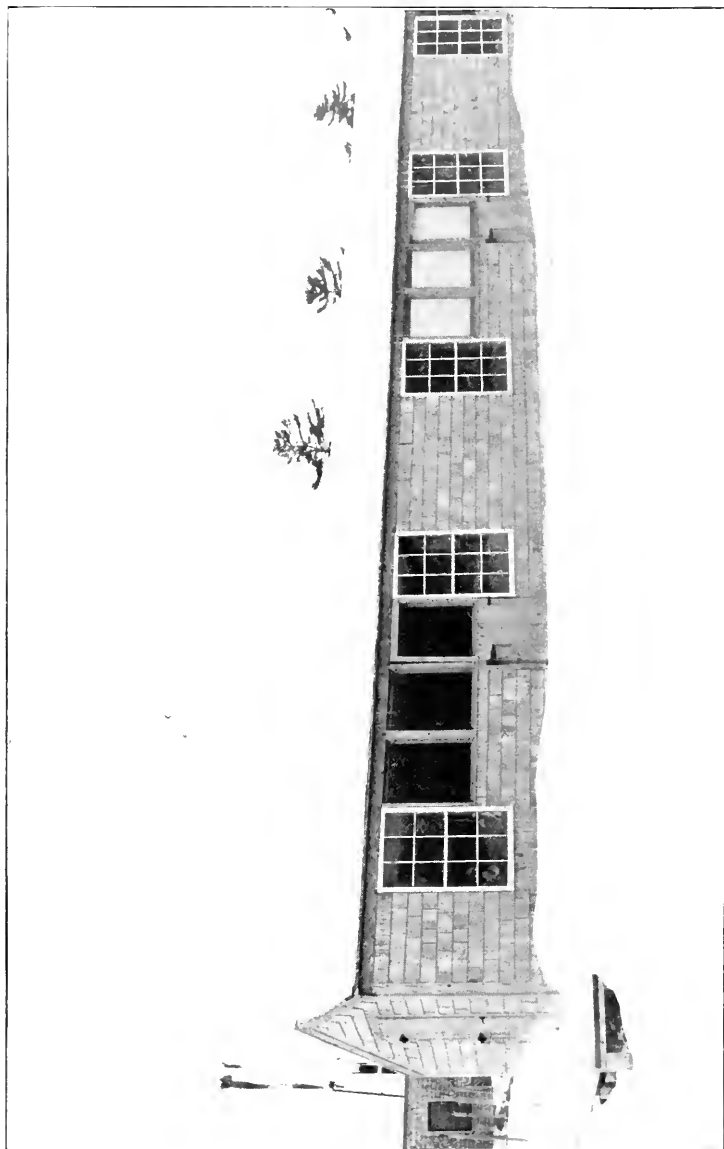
TWO SECTIONS OF CURTAIN-FRONT HOUSE.
